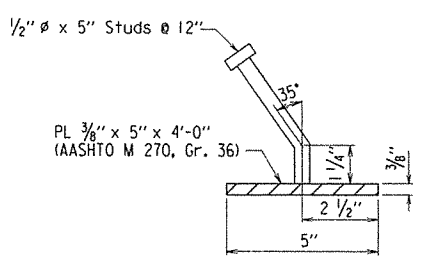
DETAILS OF OPTIONAL SLIP FORMING OF CONCRETE PARAPET RAIL
